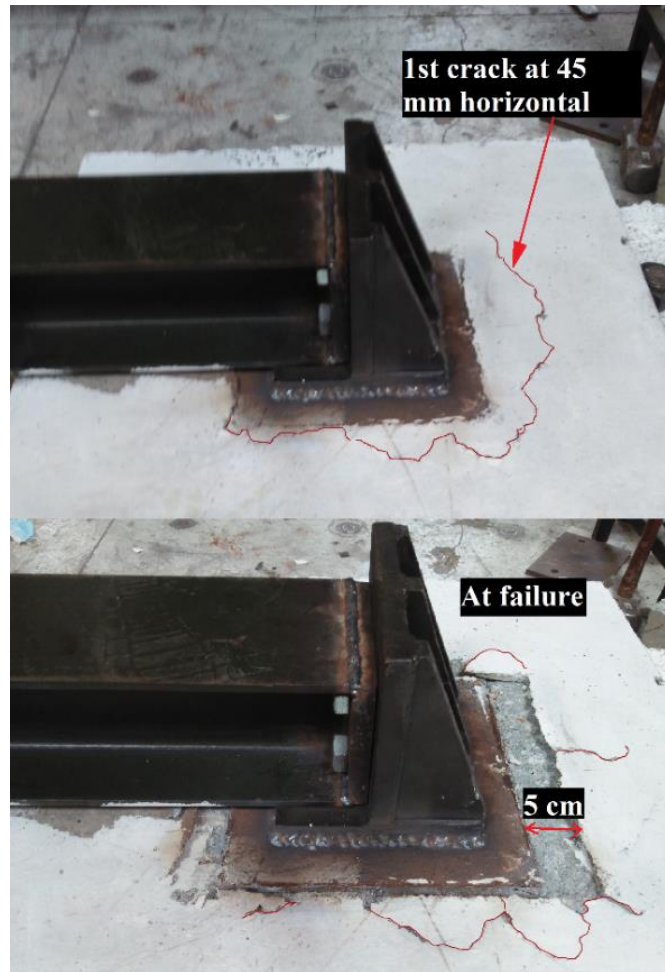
The shear punching in the upper concrete slab of specimen HC under the horizontal pushing and pulling with first and at failure crack
